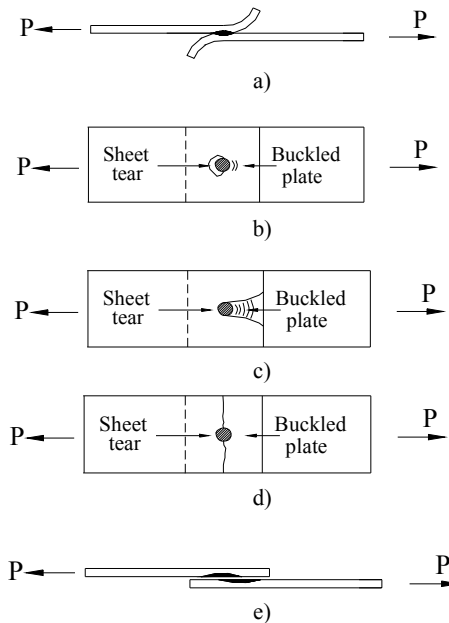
Failure modes in spot welds (Stark & Soetens, 1980): a) Inclusion failure; b) tearing and bearing at weld contour; c) Edge failure; d) Net section failure; e) Weld shear failure
